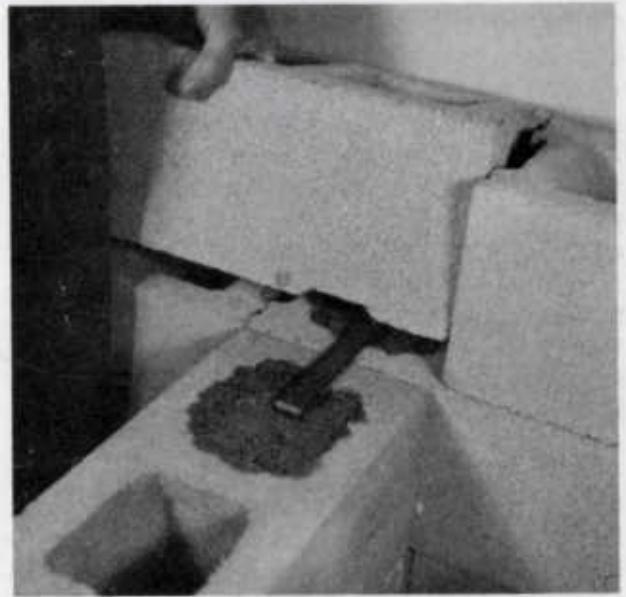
Tie bars set in block cores filled with concrete or mortar to tie intersecting walls together.
